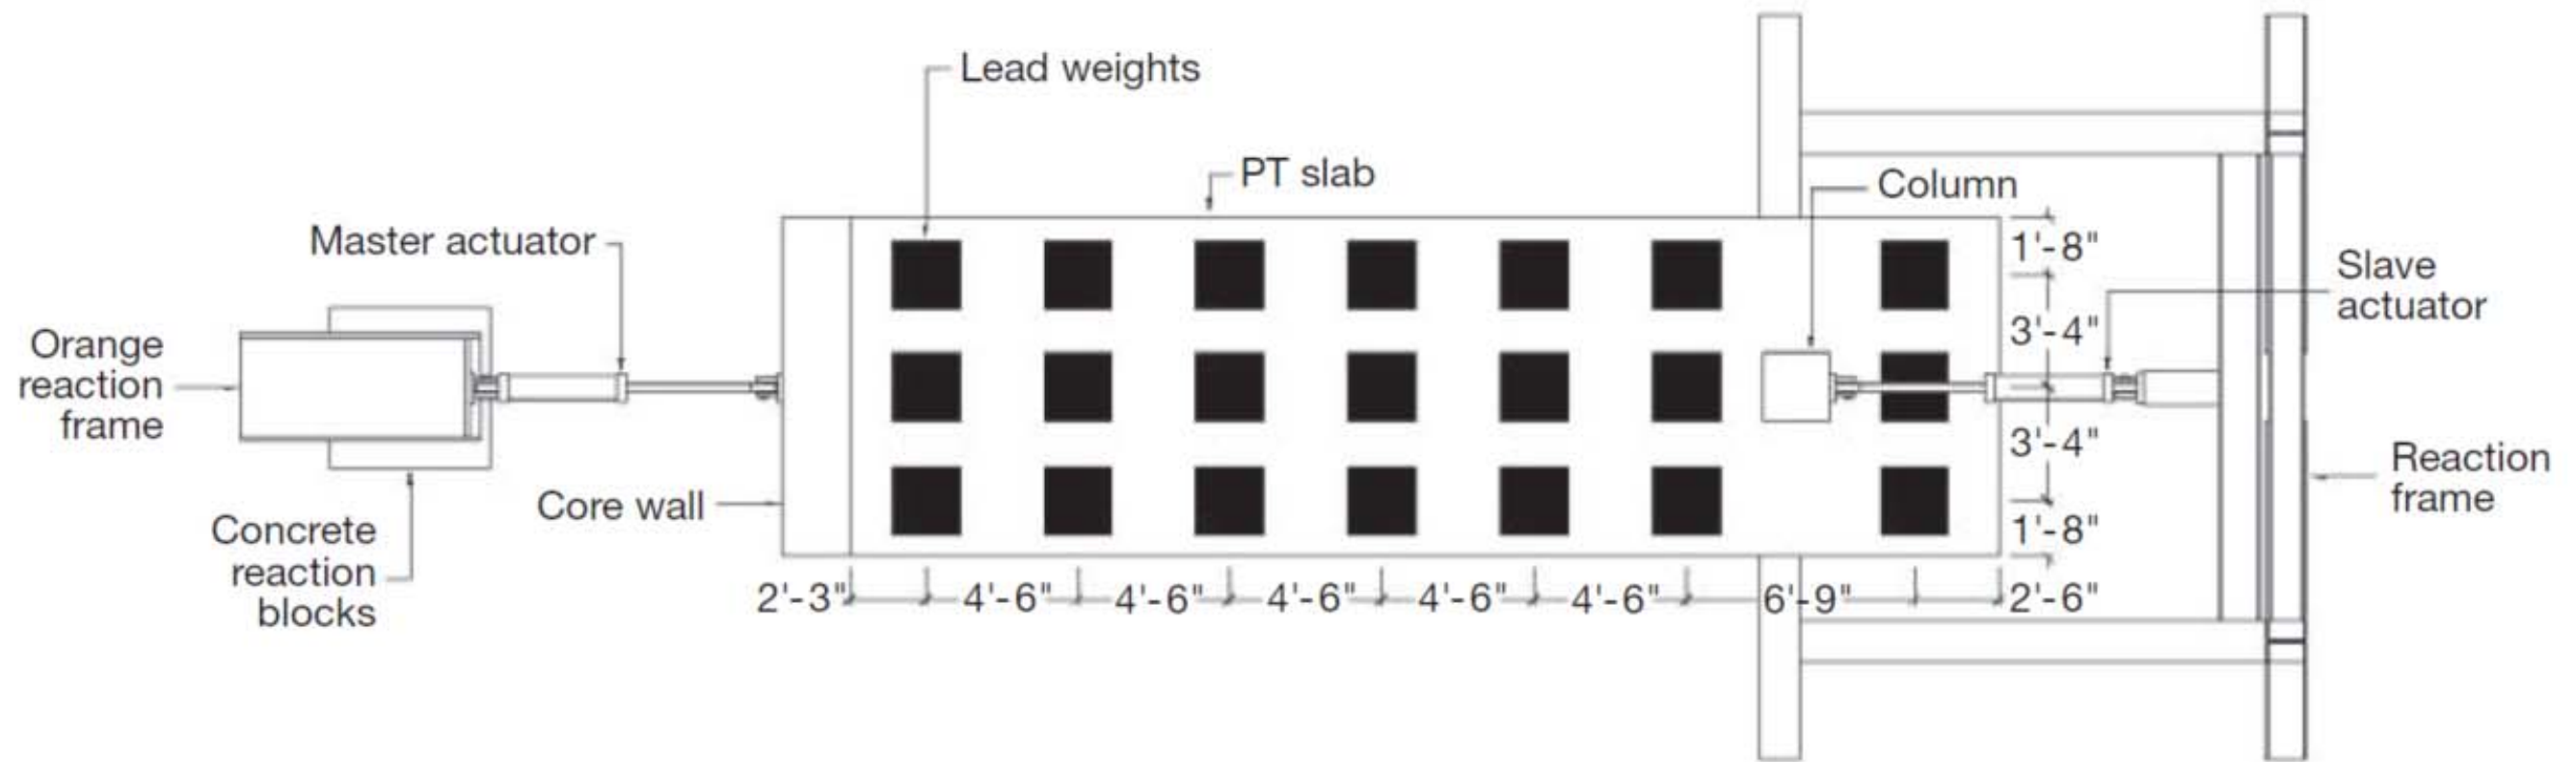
Plan of Test Set-Up Showing Superimposed Loads
